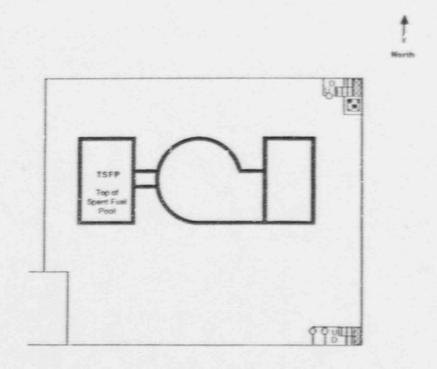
Limerick 2 Reactor Building, Elevation 352'
